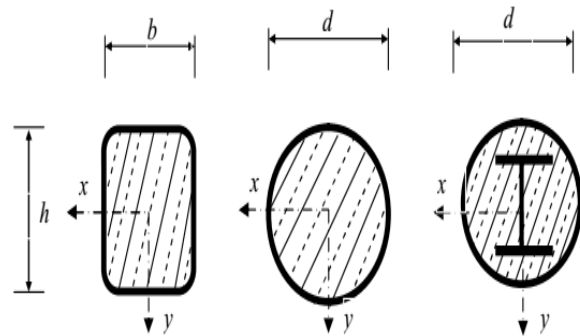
Typical Cross-Sections of Concrete Filled Tubular Sections
